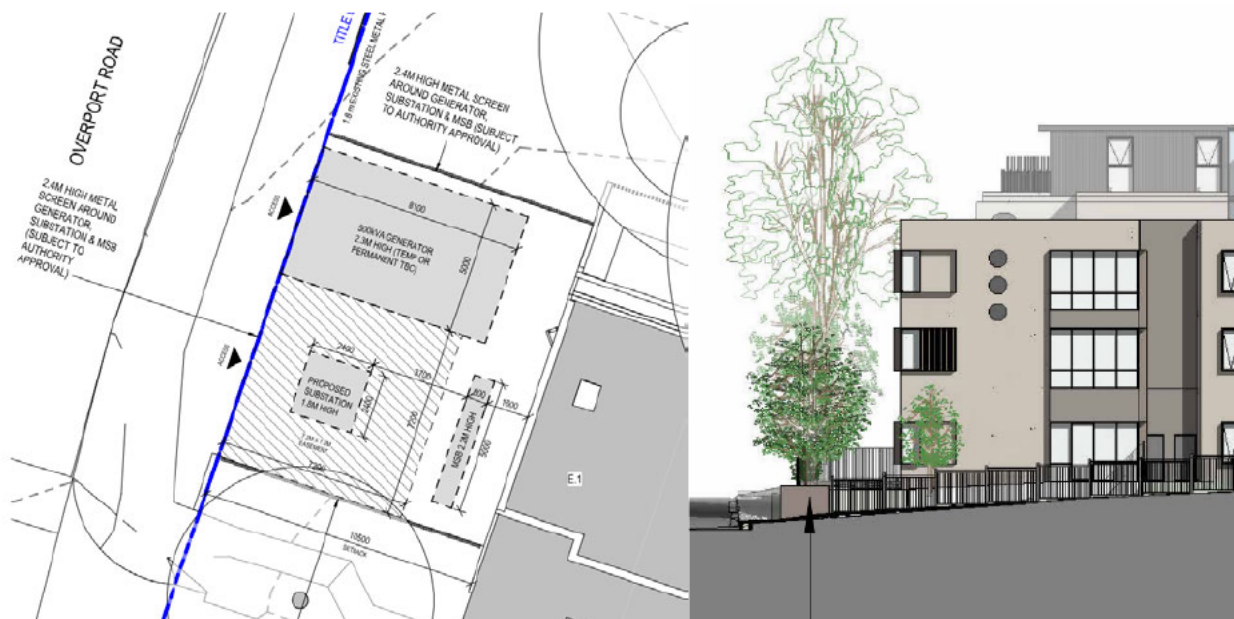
Excerpt from Block E plans showing proposed building service area and screening extent in Overport Road frontage (left) and excerpt from Overport Road elevation demonstrating appearance of 1.8m high open fencing (Source: Development Plans, Thomson Adsett)
